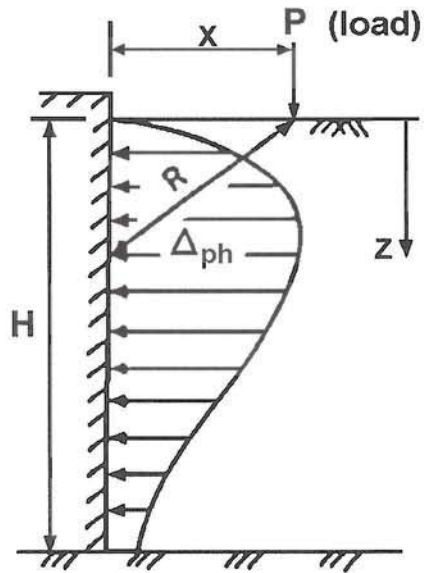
Horizontal Pressure on a Wall Caused by a Point Load
